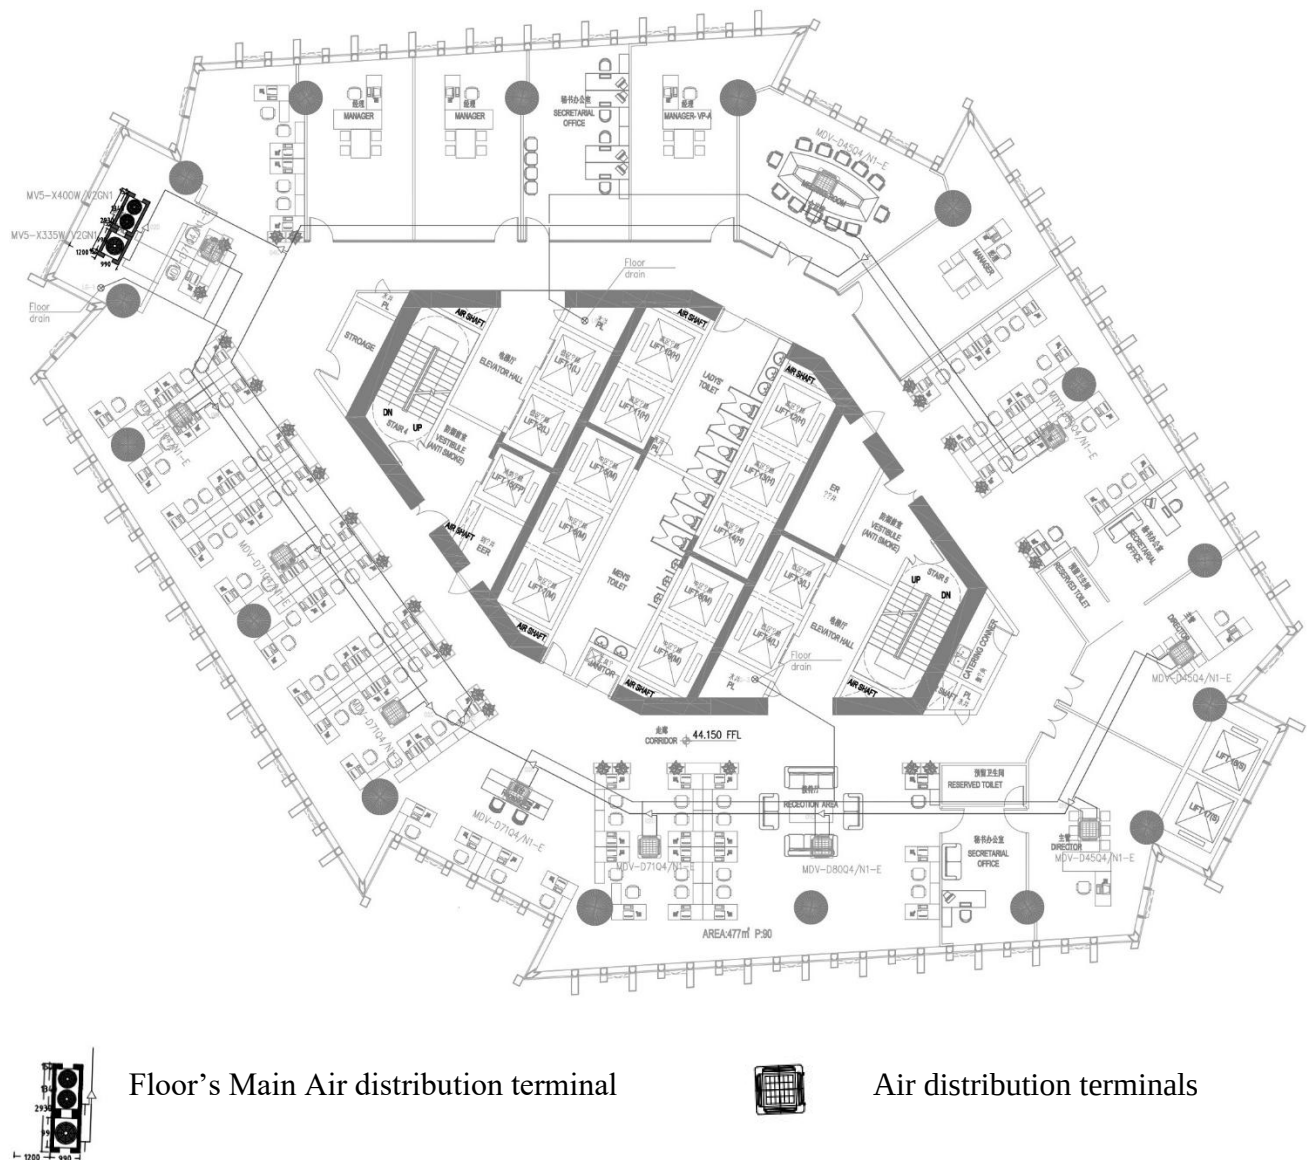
Tenth-floor plan of new CBE HQ Tower
